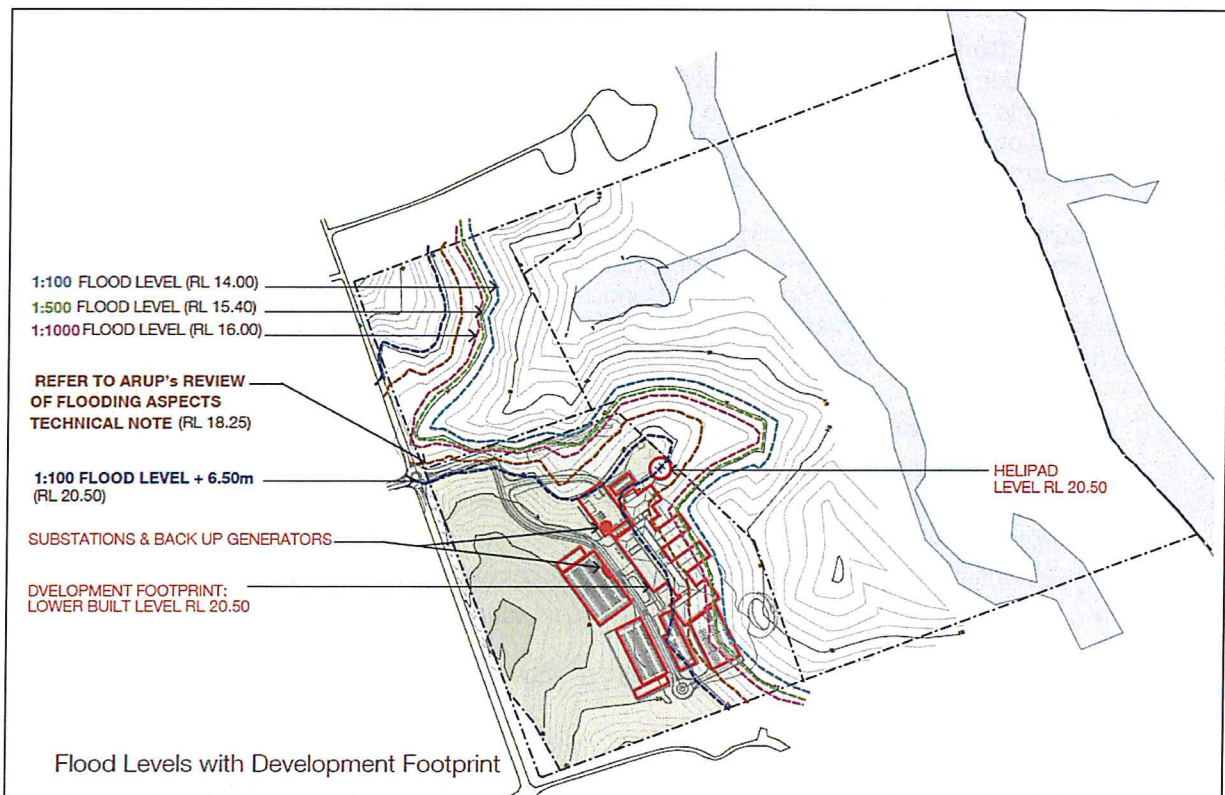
Flood Levels with the development footprint (source: BVN Architecture)
